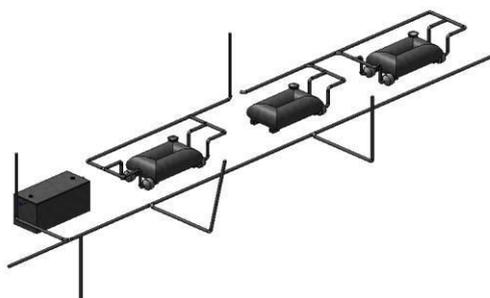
Grey water recycling and rain water harvesting plants (Underground)
